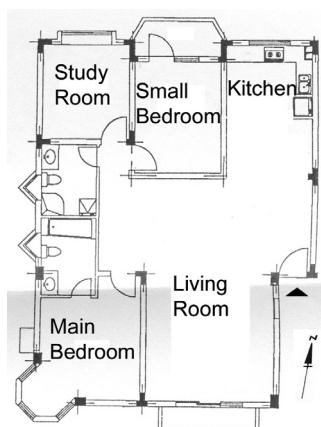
Apartment Internal Plan (After Occupant's Bulletin)
